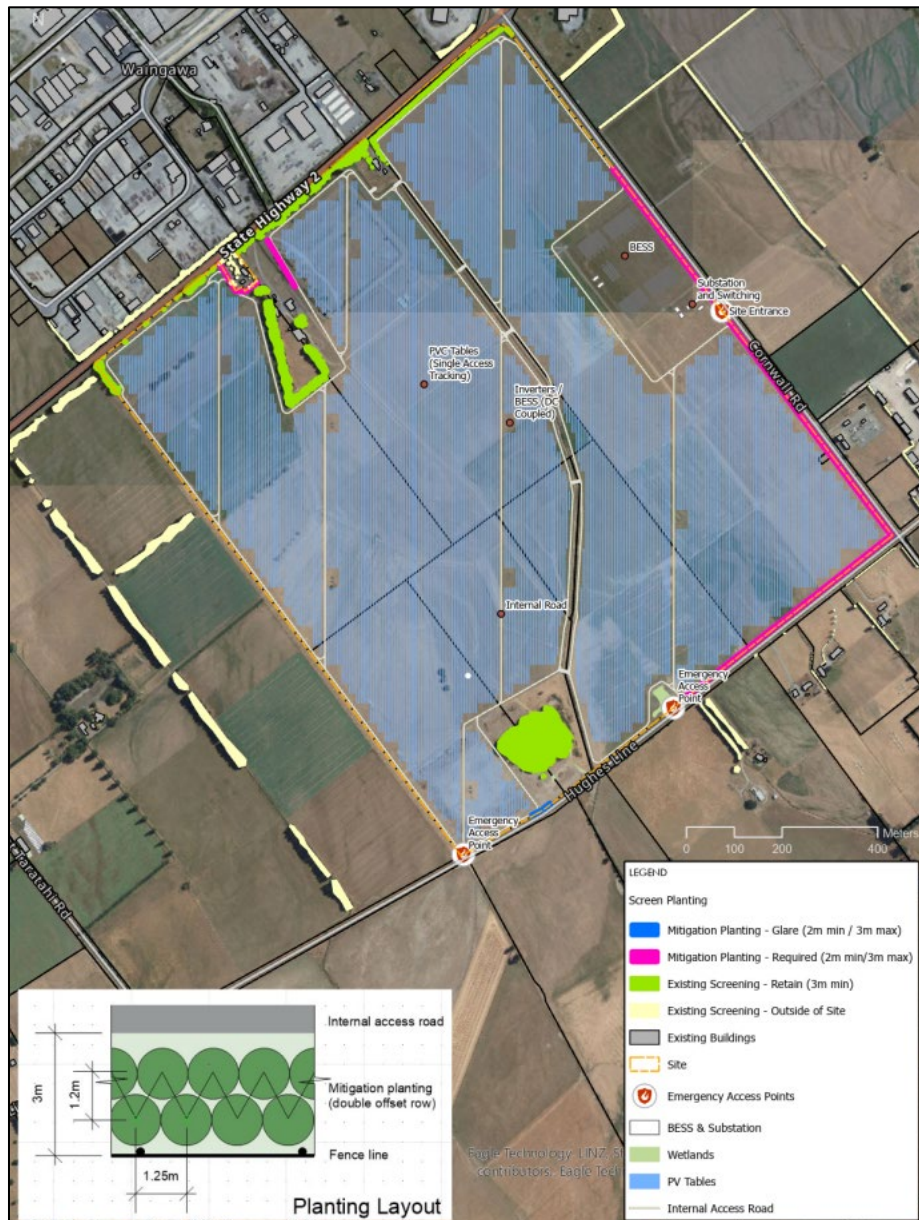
Plan of mitigation planting (Mansergh Graham Landscape Architects, Appendix 7).
